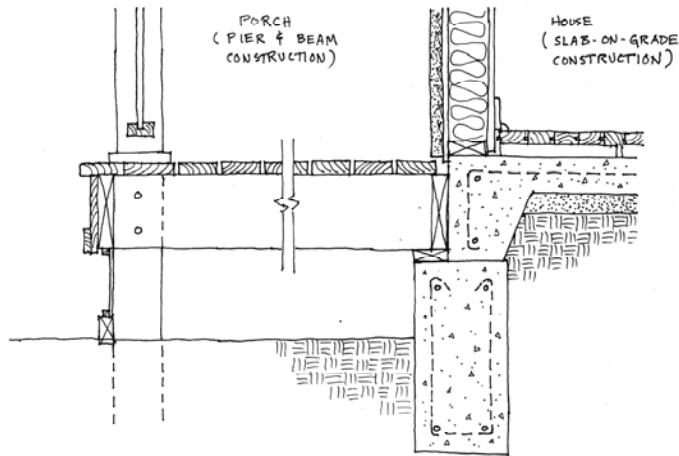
A combination foundation with a porch on pier and beam and the main structure on slab.
